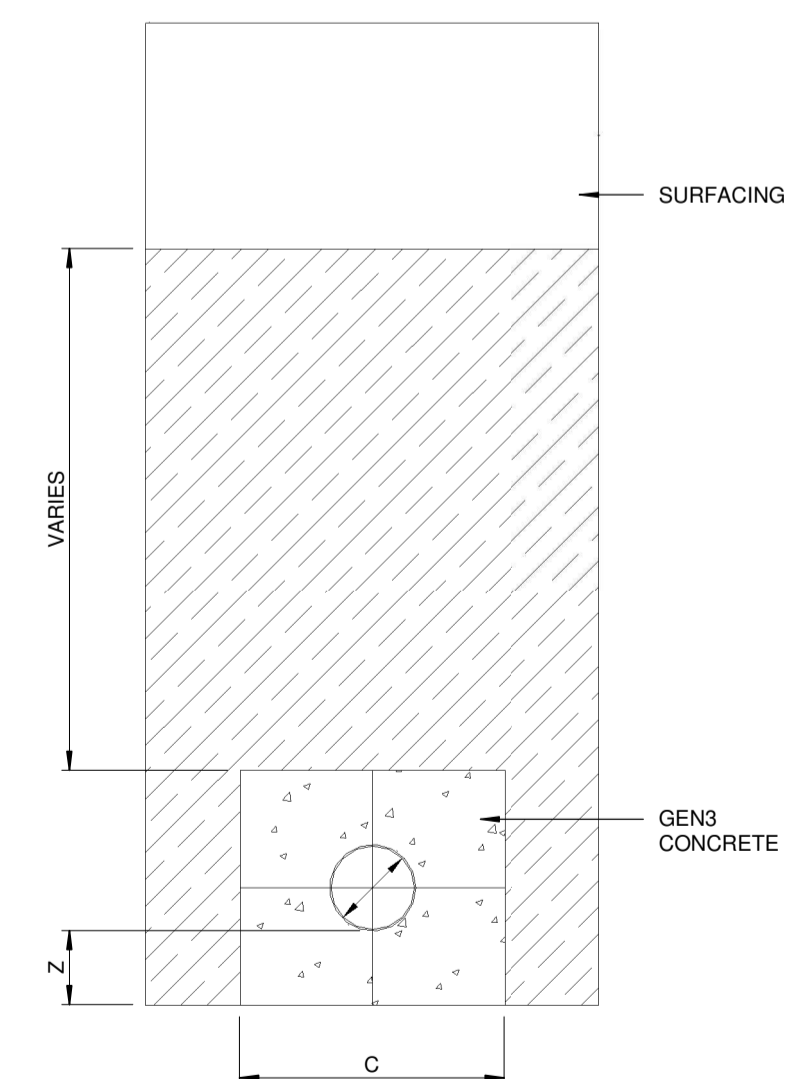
INDICATIVE SECTION THROUGH MANHOLE
